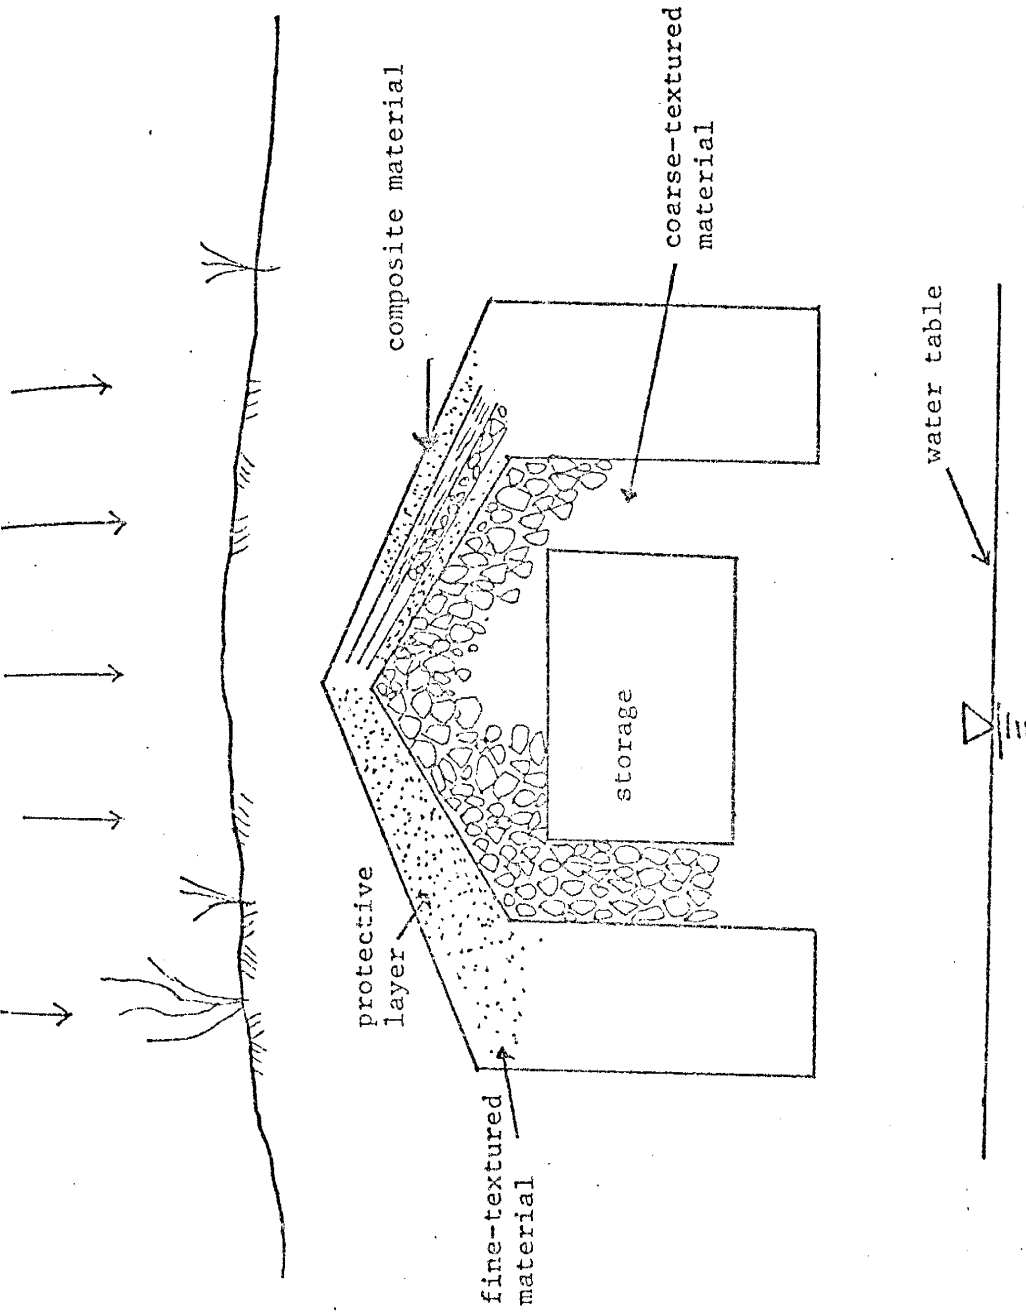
Configuration of the shallow underground waste storage facility.
